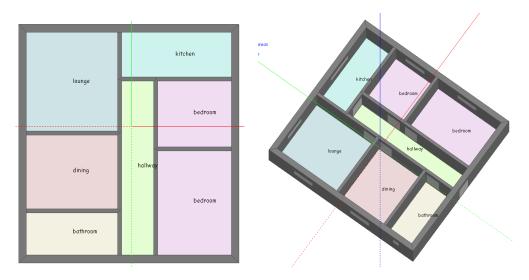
Floor plan of Flat Model (and view with doors and windows)
